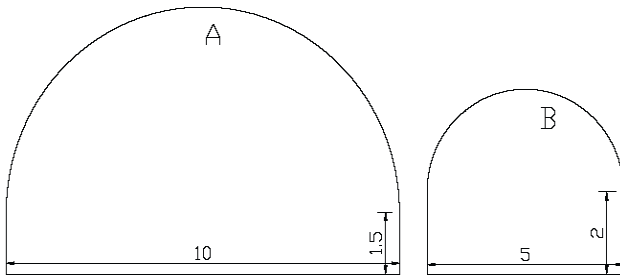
(A) Geometry of road tunnel (m); (B) geometry of mining tunnel (m).
